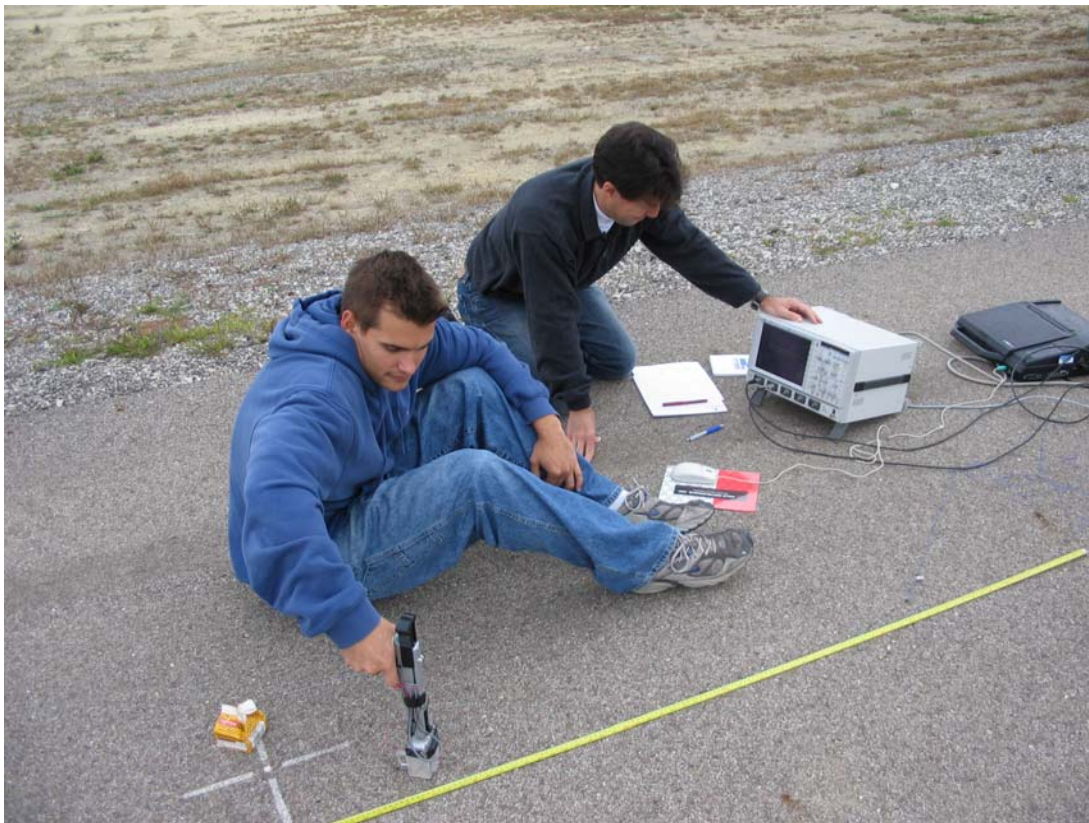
Application of seismic method to full-depth asphalt pavement at ATREL test facility.
